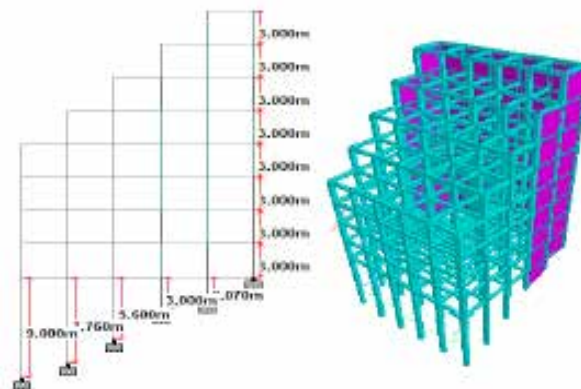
Elevation of C Shape Shear Wall with 15° Slope
